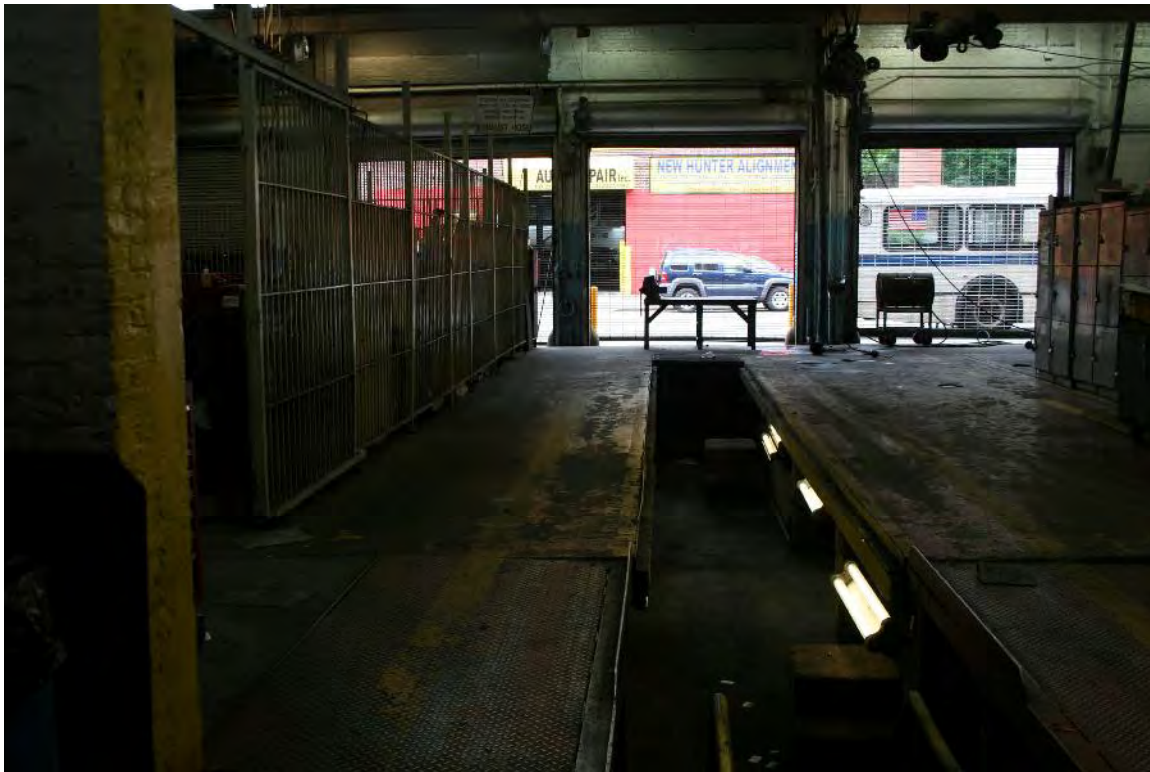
Photograph N: Power conduits from Lift Oil Tanks, ca.18 inches below grade, facing east.
